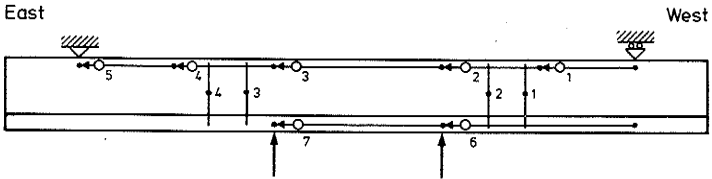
Loading diagram and positions of gauge stirrups and dial gauges
